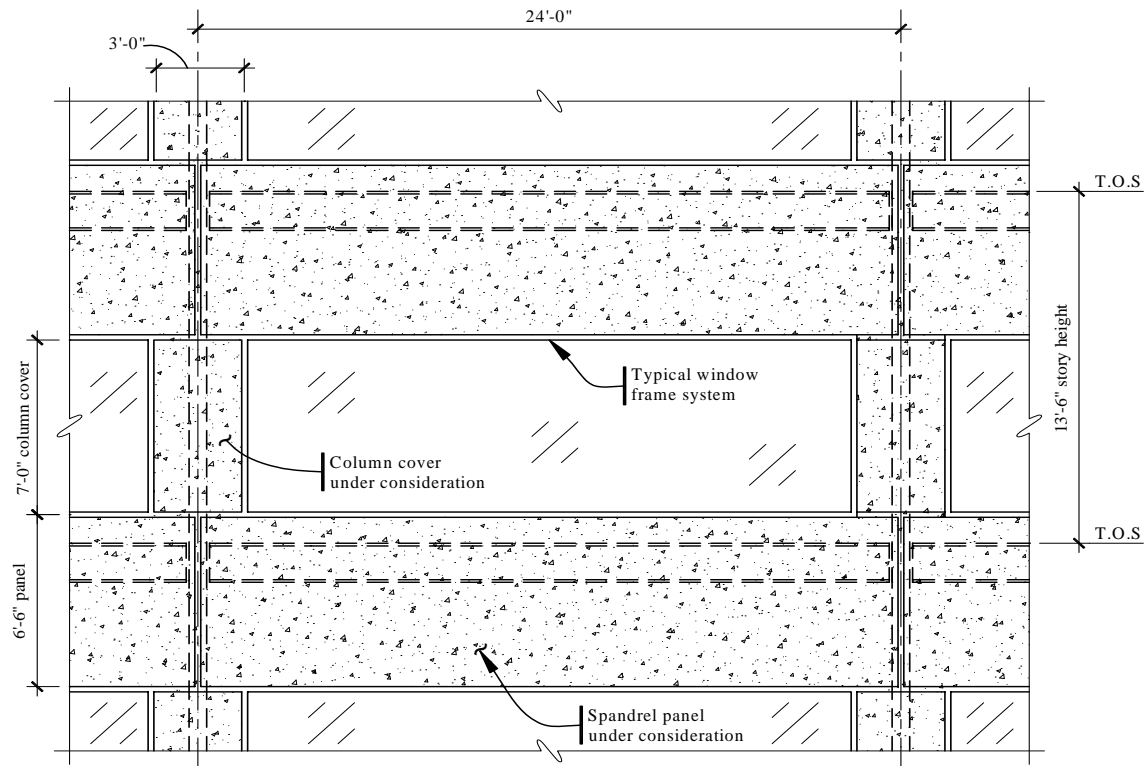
Detailed building elevation (1.0 ft = 0.3048 m).
